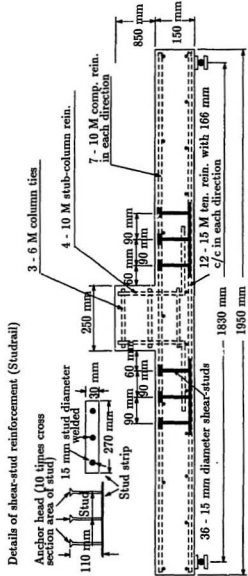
Dimension and reinforcement details of the slab with shear-stud reinforcement (HS22)
